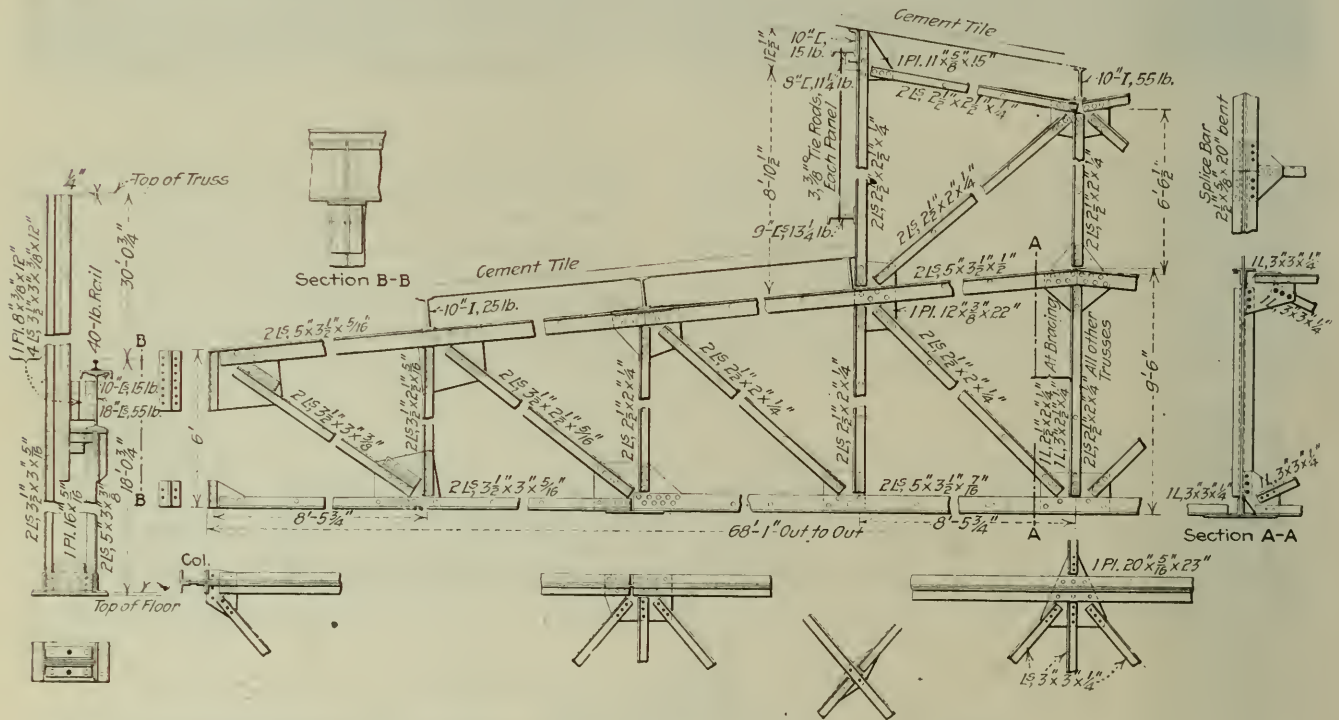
TYPICAL STEEL ROOF CONSTRUCTION (GALVANIZING BUILDING)
